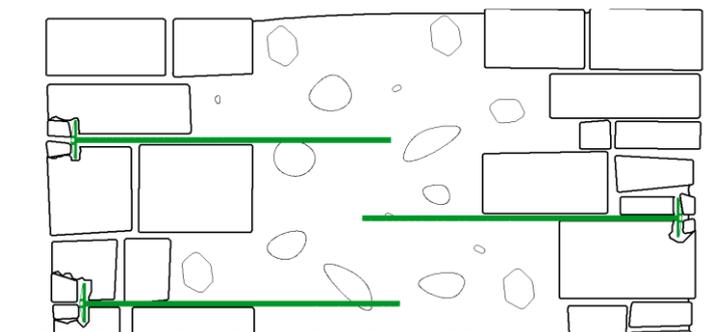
Scheme of nailing with the supplementation of the wall's face of the „opus emplectum” type
